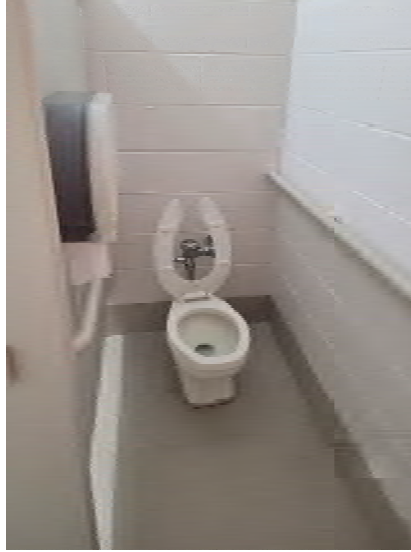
Jamestown Public Park Toilet Room Stall View 3
